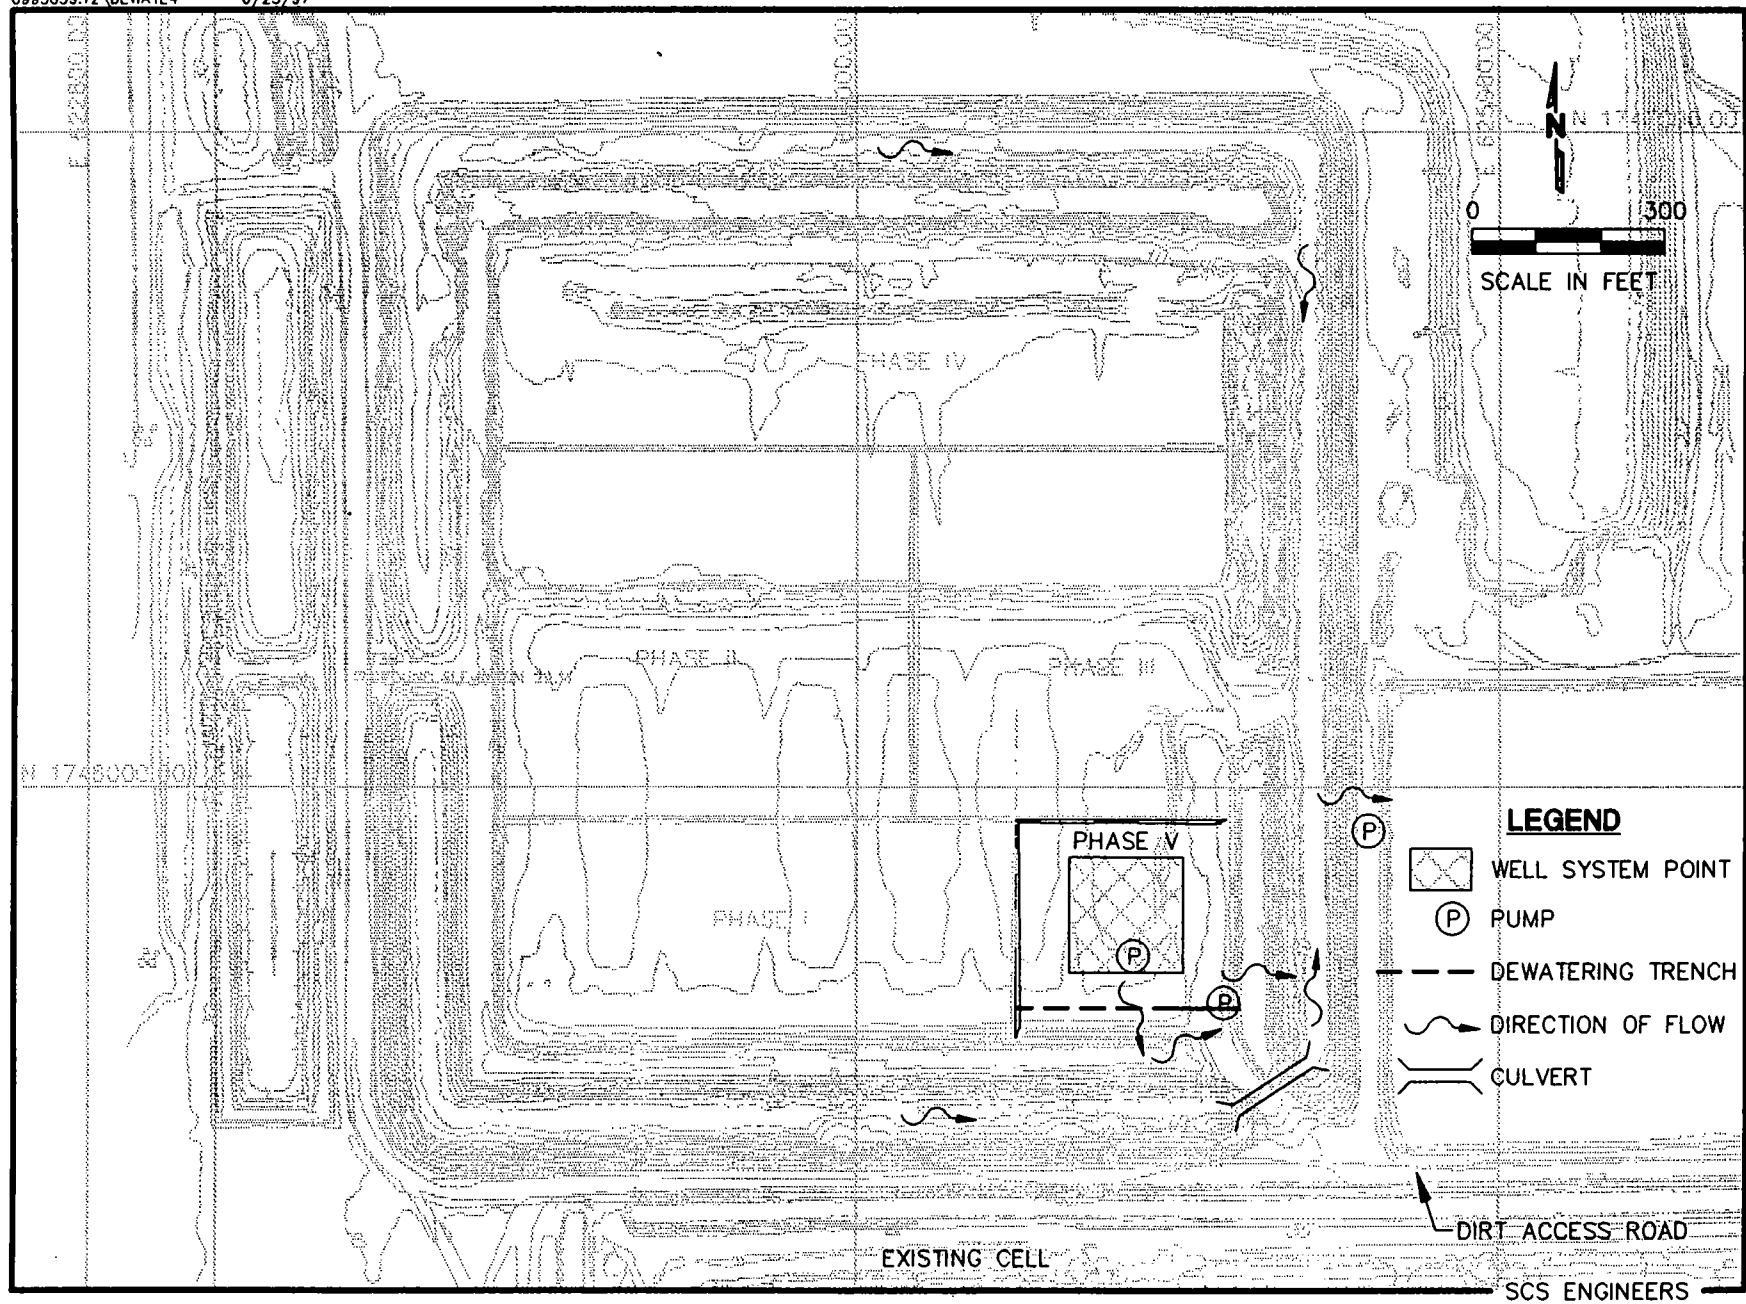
Step IV Dewatering Plan (Site Conditions On 12/10/96).
